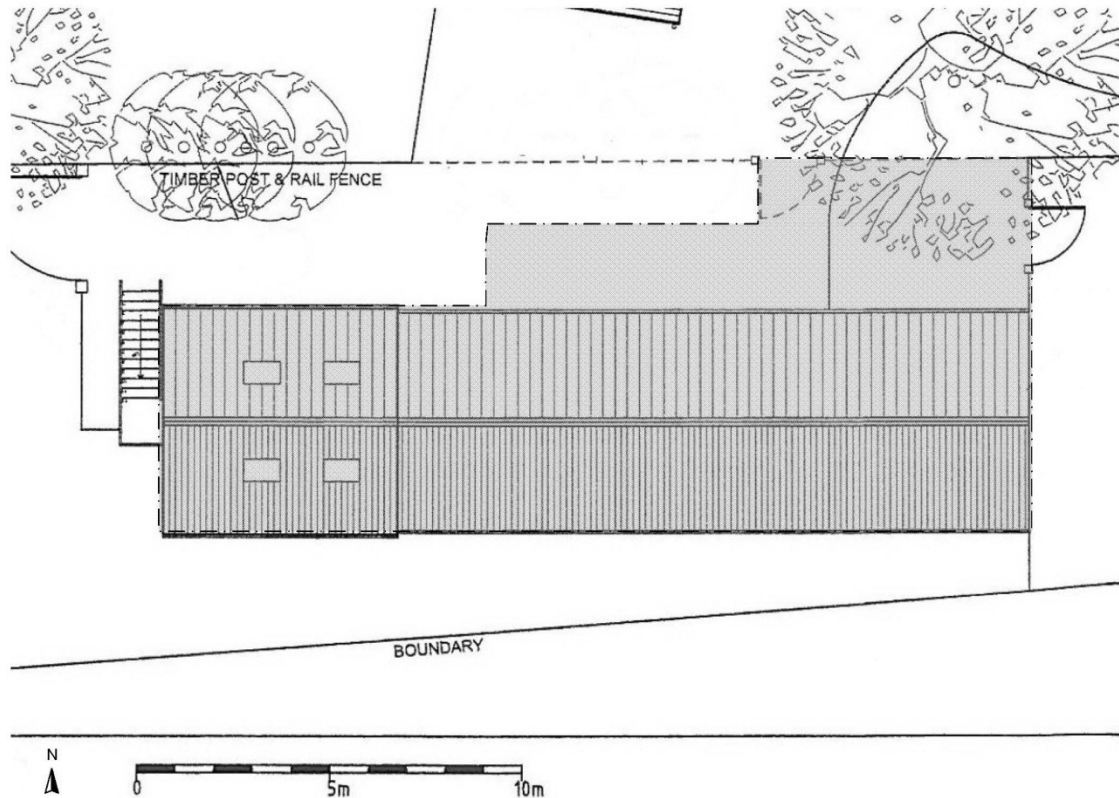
Detailed view of area removed of topsoil and subsoil, shaded grey (modified plan from client)
